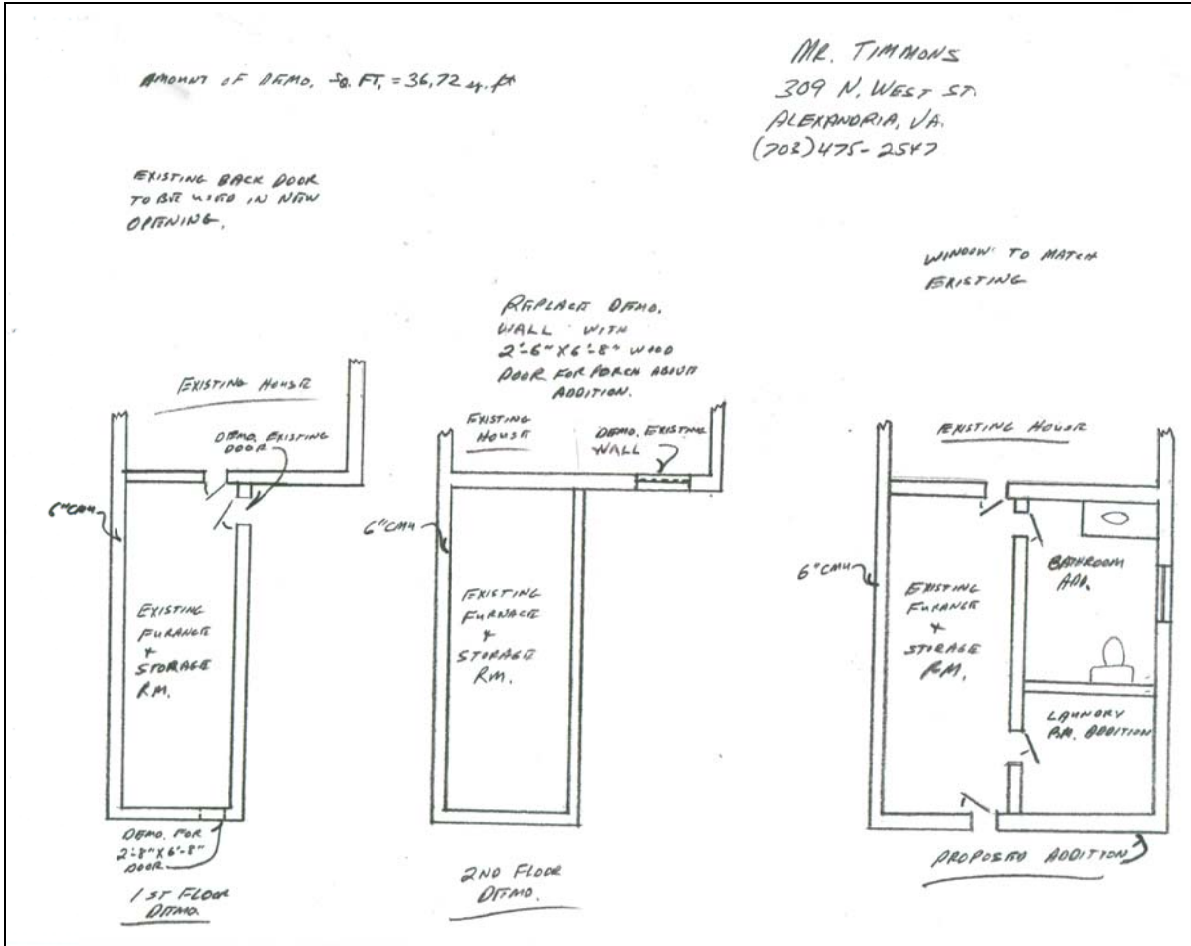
Existing and proposed floorplans illustrating area proposed for encapsulation and demolition.
